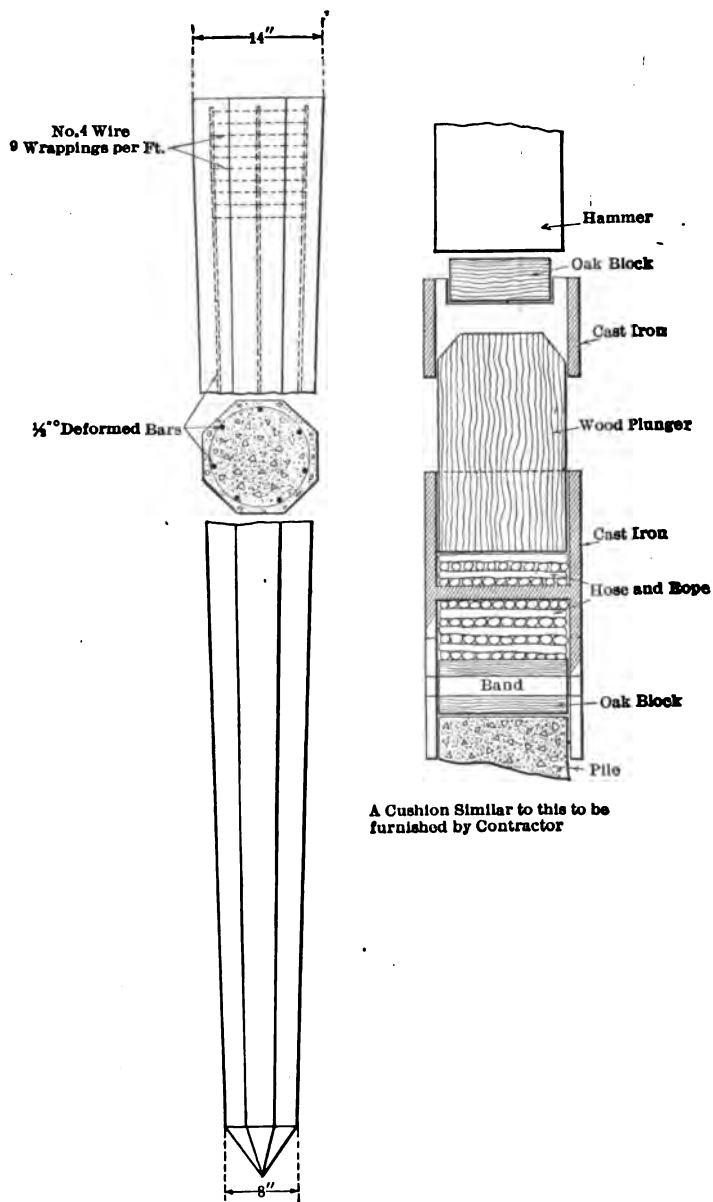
REINFORCED CONCRETE PILE AND DRIVING CAP.
